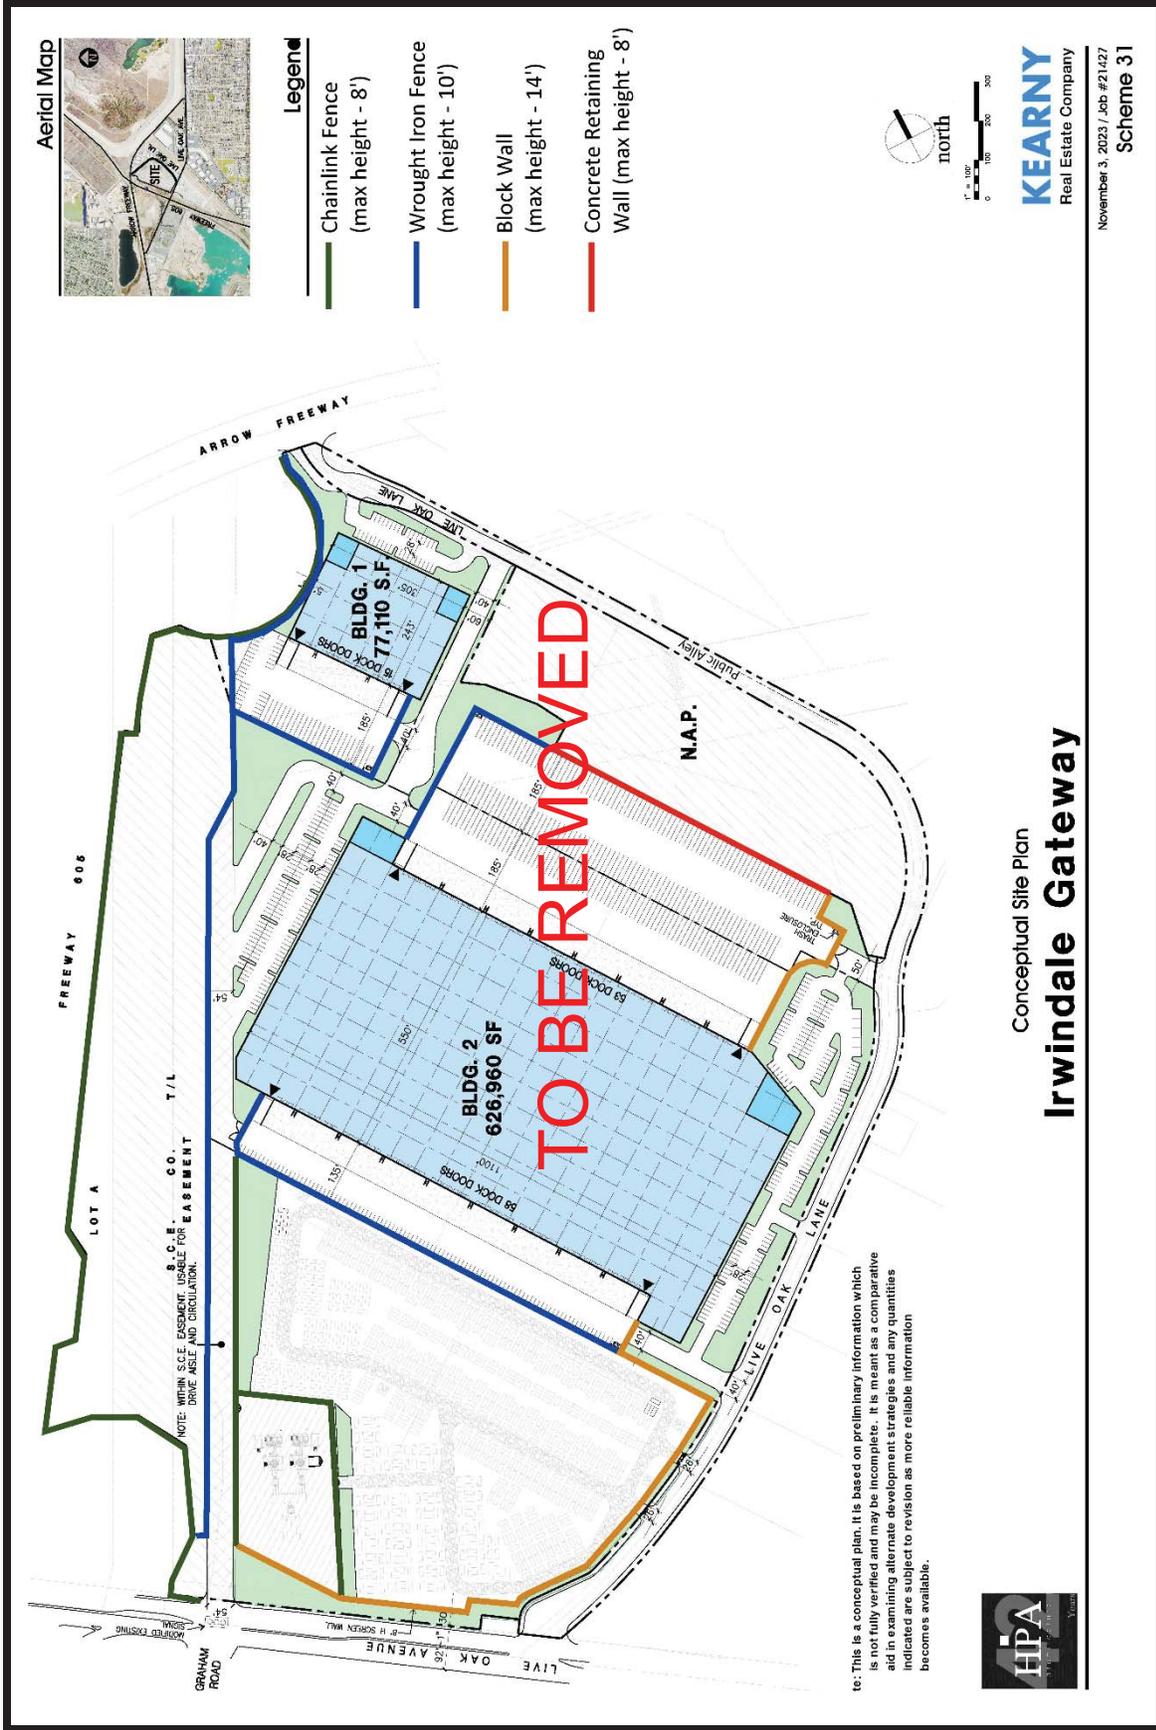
FENCE AND WALL PLAN WITH BESS
